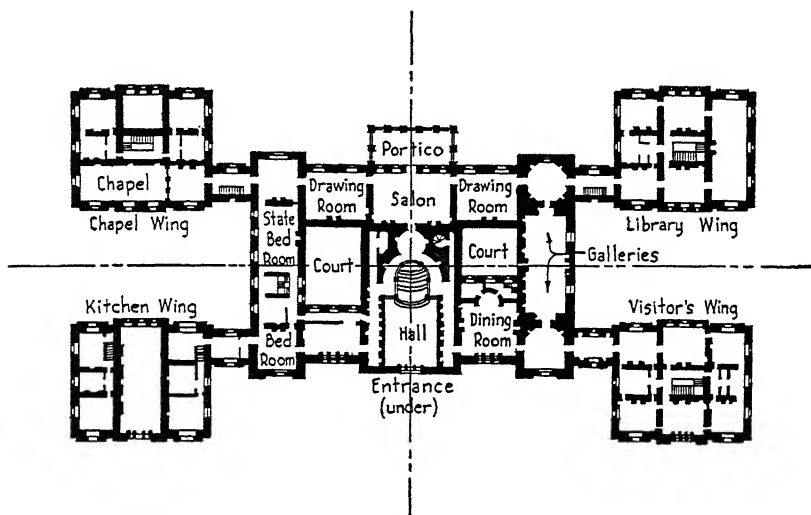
PLAN, HOLKHAM HALL, NORFOLK (1734)
